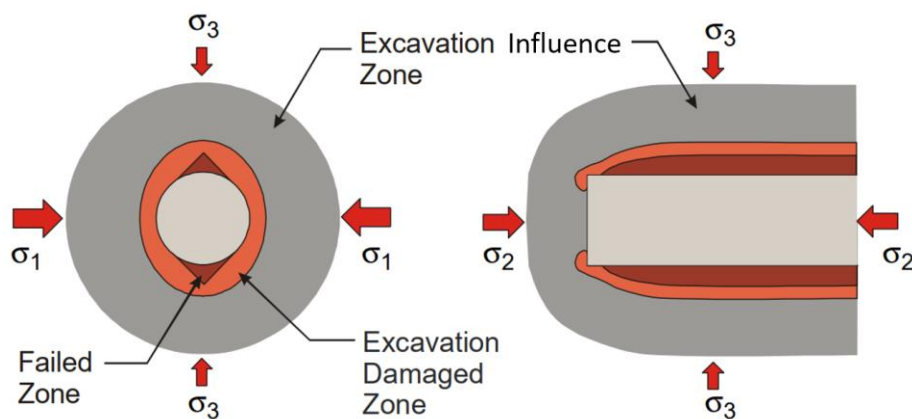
Schematic illustration of excavation damage zones around a circular tunnel (Read, 2004)
